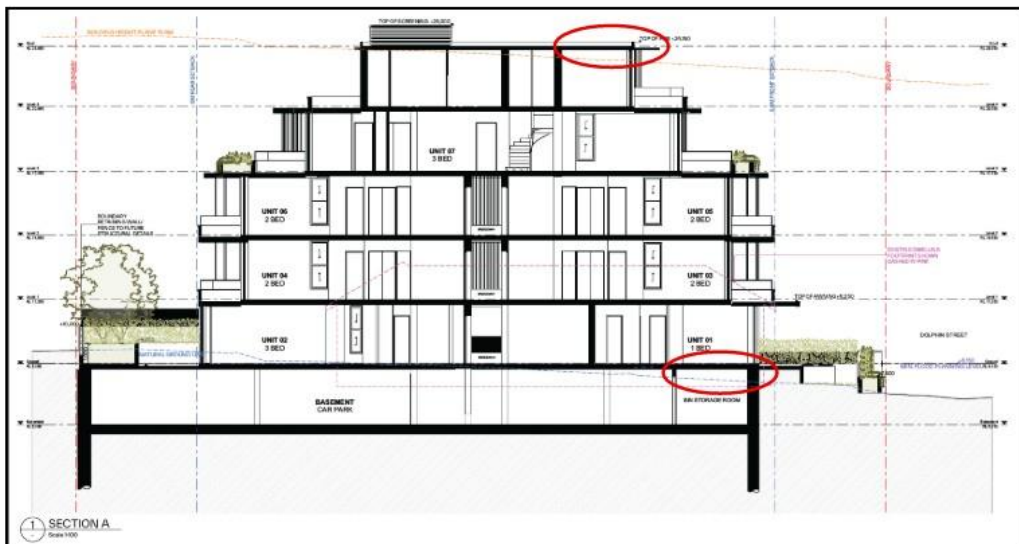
Extract of Section A, noting the minimum flood planning level and height variation
